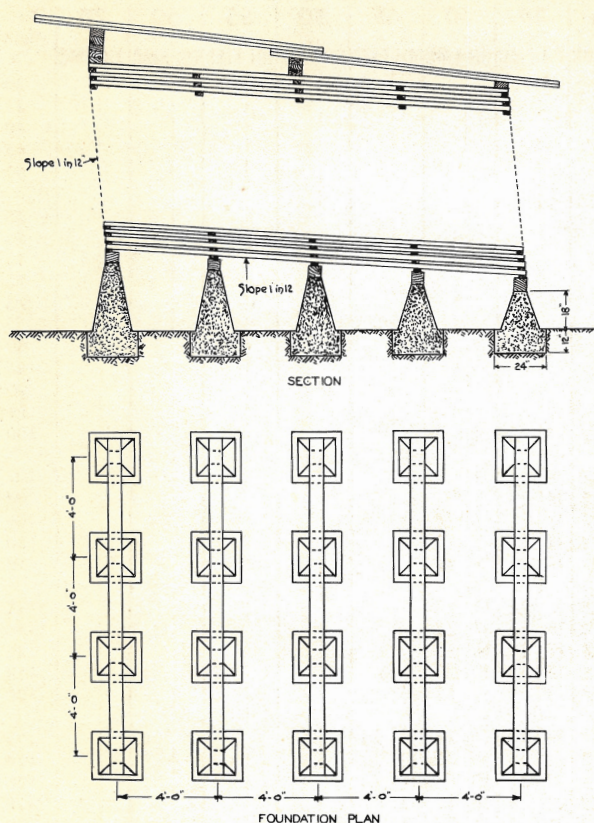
Suggested Foundation and Piling Arrangement for Air-seasoning.
